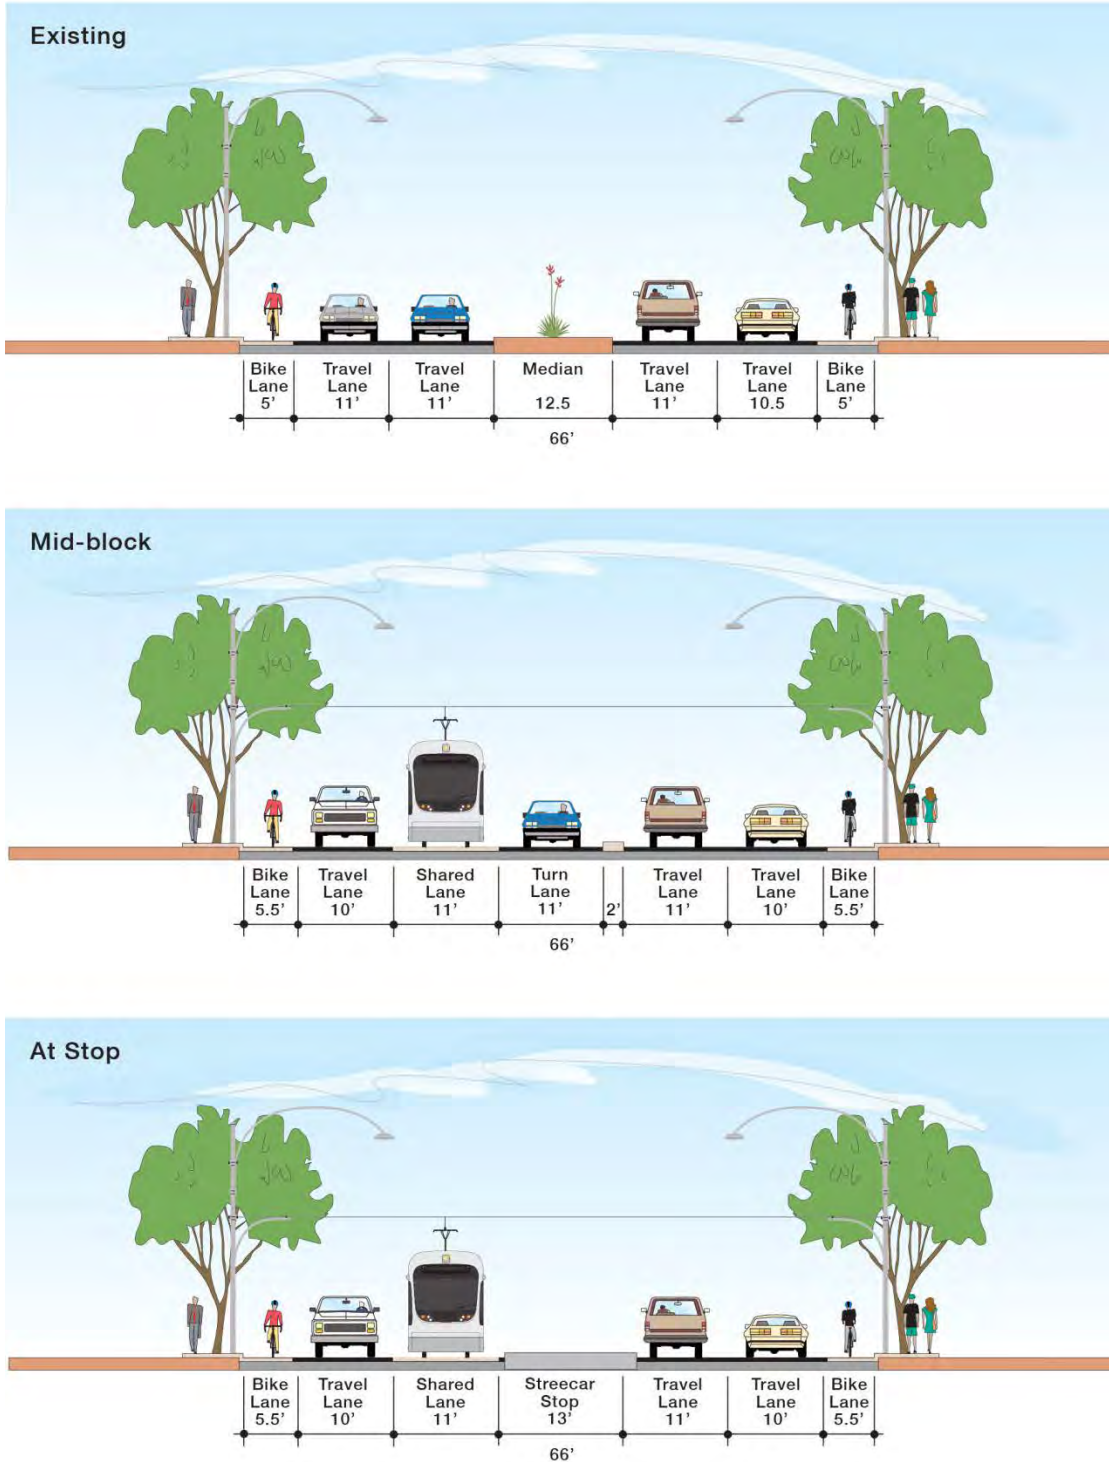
BUILD ALTERNATIVE, ASH AVENUE LOOKING NORTH
